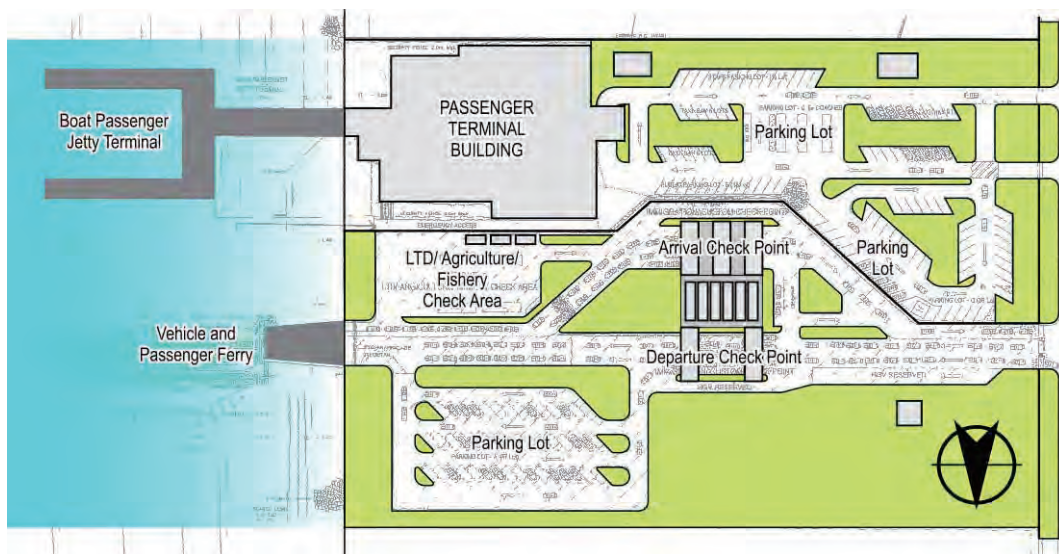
Layout Plan of Serasa Ferry Terminal
